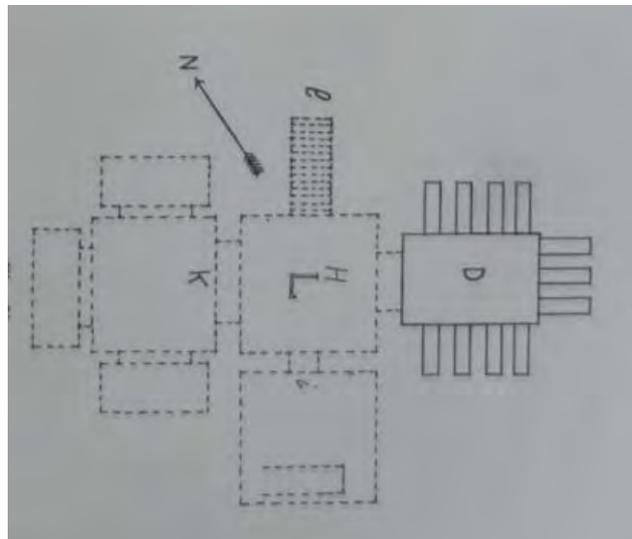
Plan of Group D, H and K and Scavo A; (Adriani 1966).
